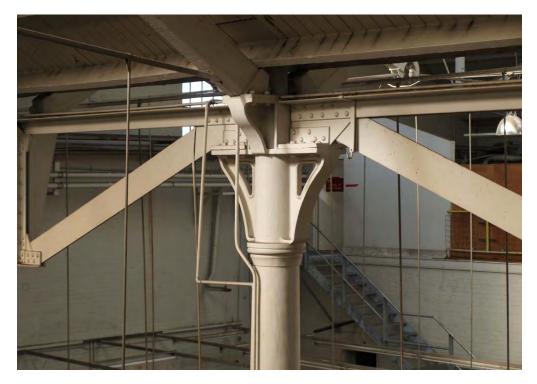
Detail of column capital, transverse beams and truss connection, Stores/Offices building (16a & 16b)
